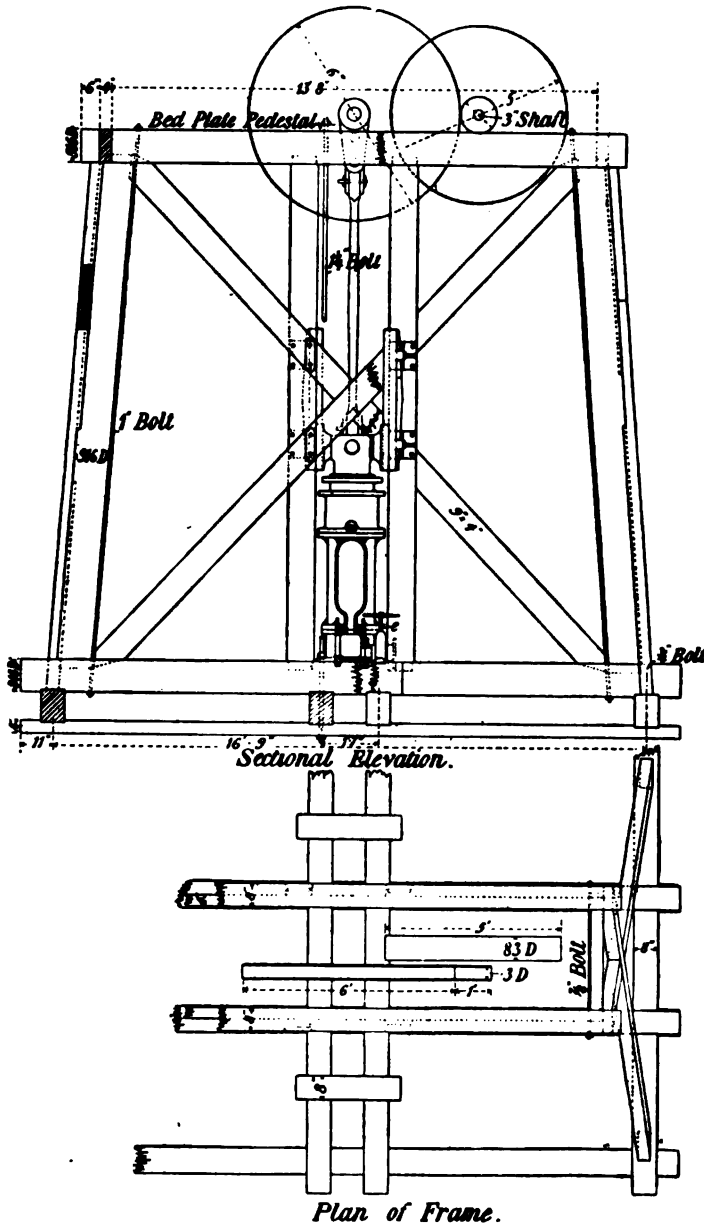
Tailings Pump ; Side View of Frame, etc.
